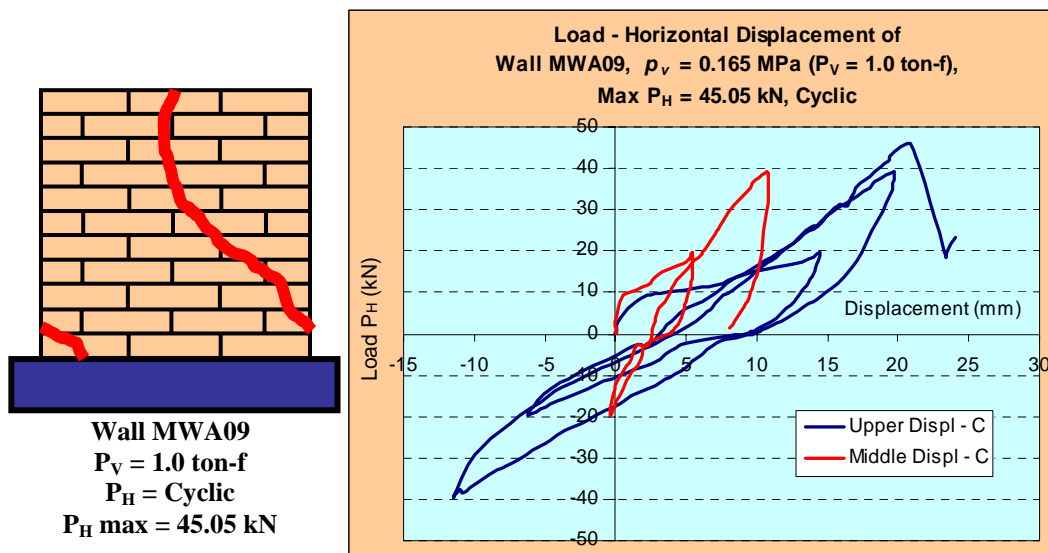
Failure pattern and load-displacement of wall MWA09
